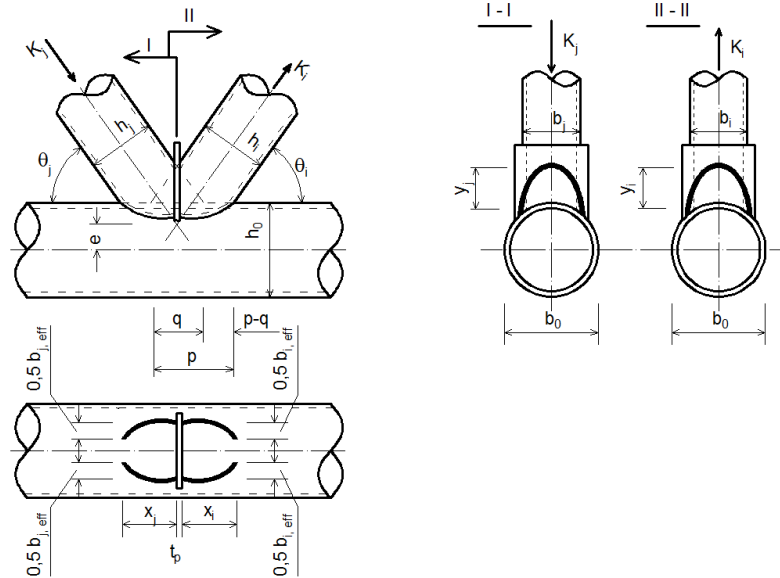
Welds layout in circular hollow section overlap joint with reinforcing rib plate
